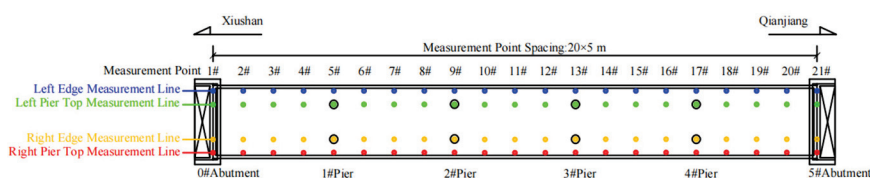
Schematic diagram of bridge deck profile measurement point layout.
